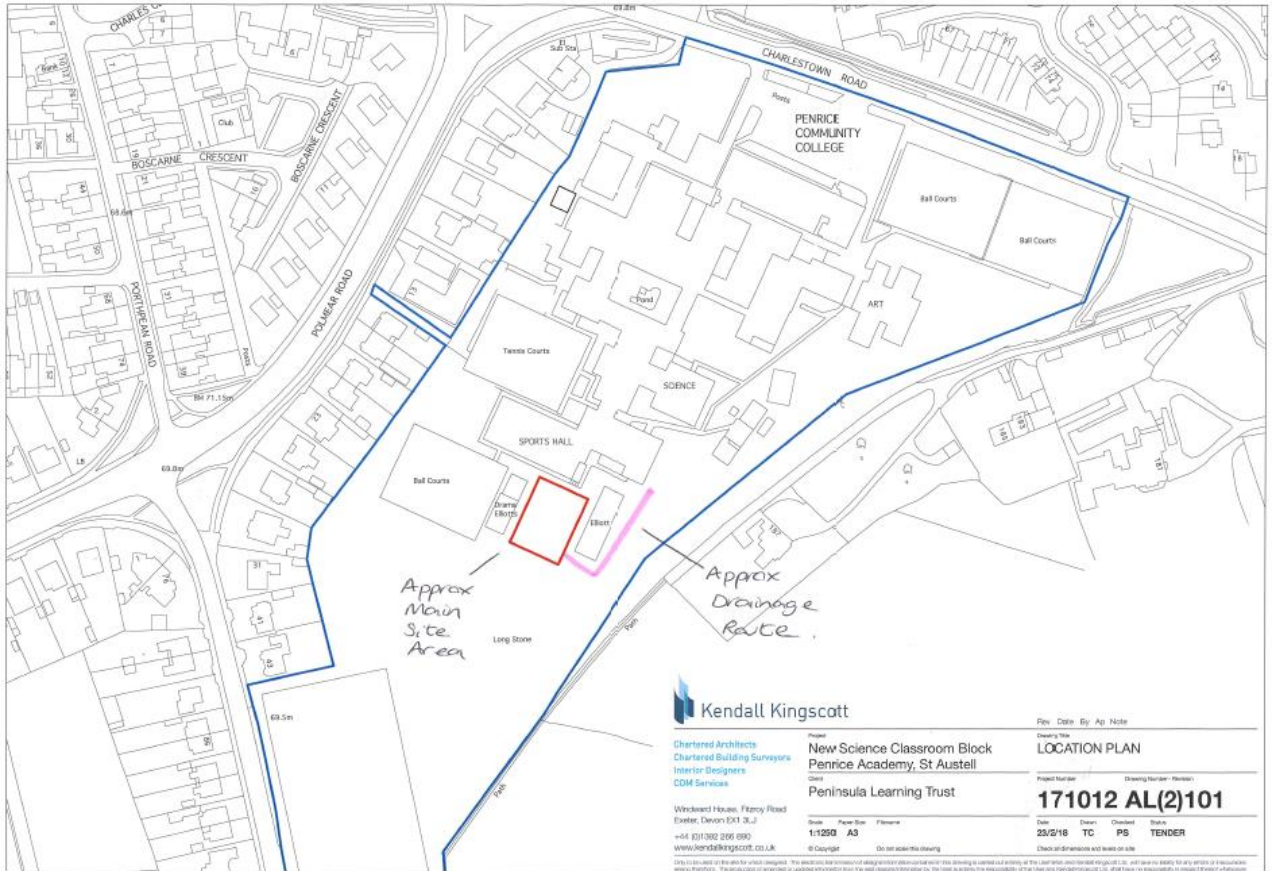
Client's site plan showing extent of works covered by watching brief outlined in red.
